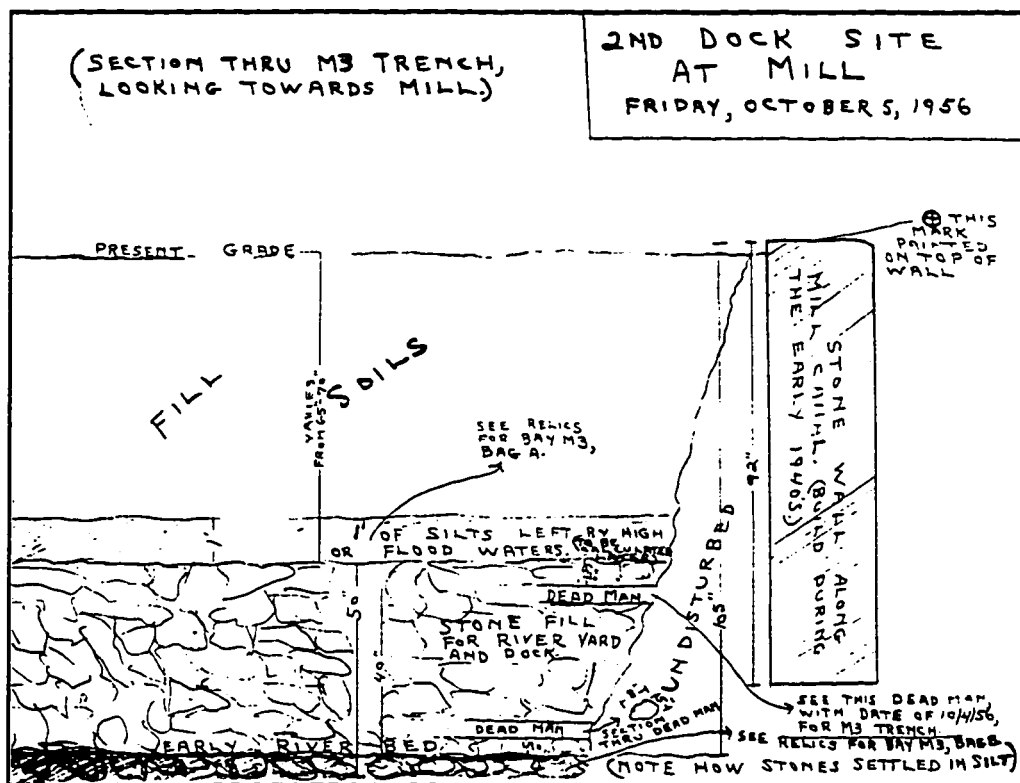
Section through Bay Trench M3 excavations, October 5, 1956.
